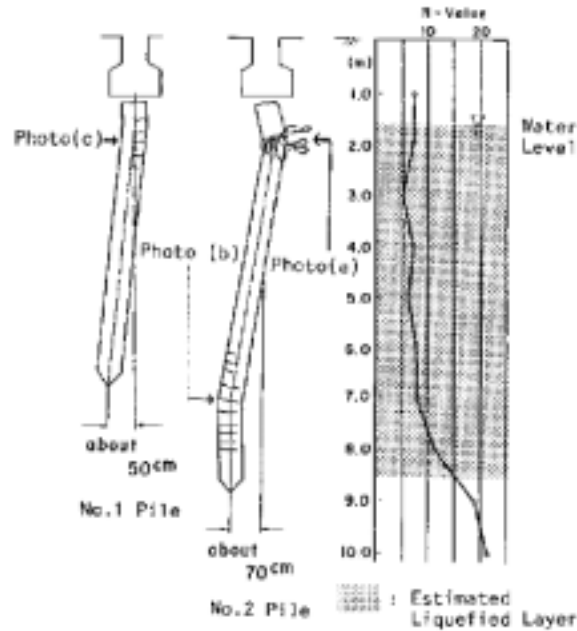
Observed Pile Deformation and Soil Conditions at NFCH Building
